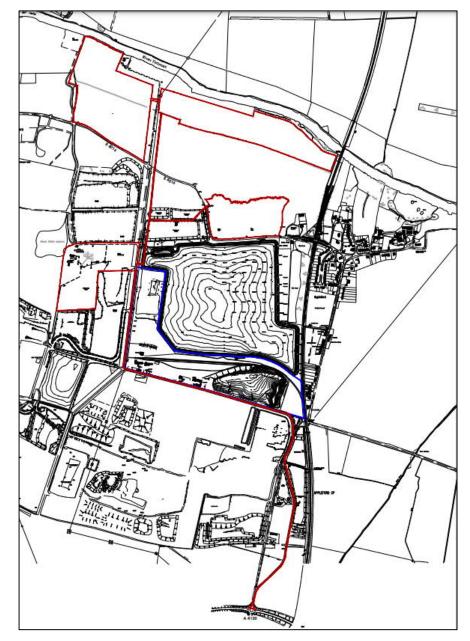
Bridge Farm Quarry Application Plan (MW.0049/19)
